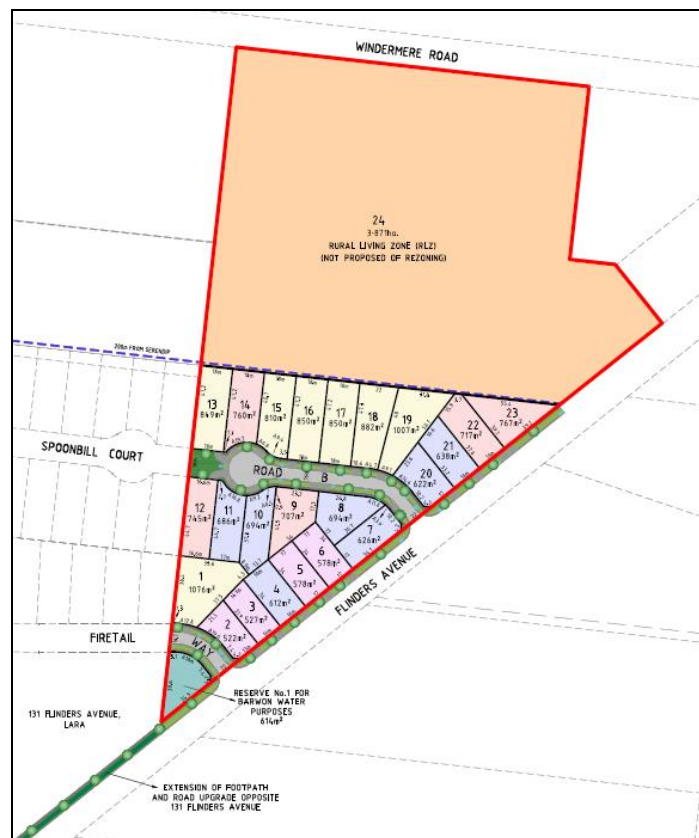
Proposed Plan of Subdivision (see Attachment 4)
